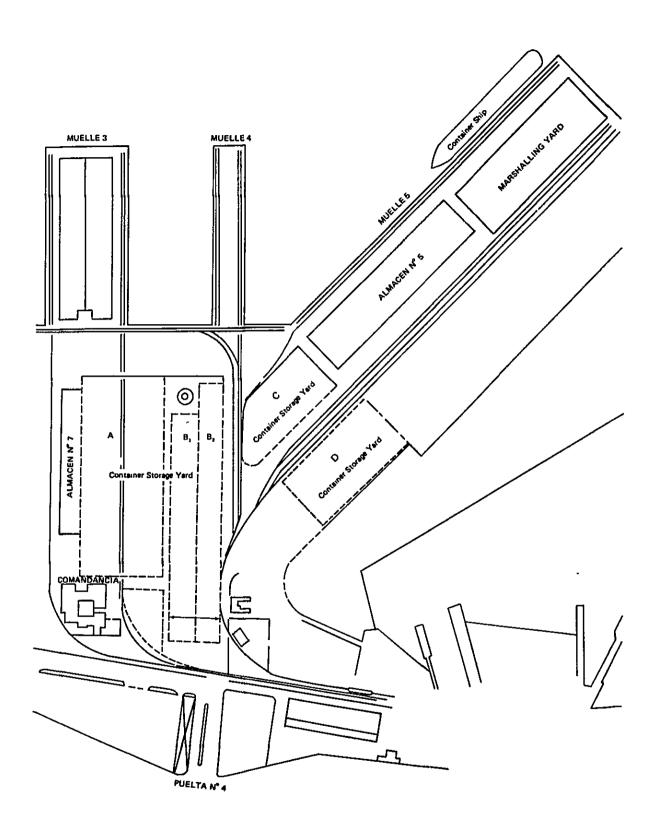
Container Handling Plan at No. 5 Wharf
